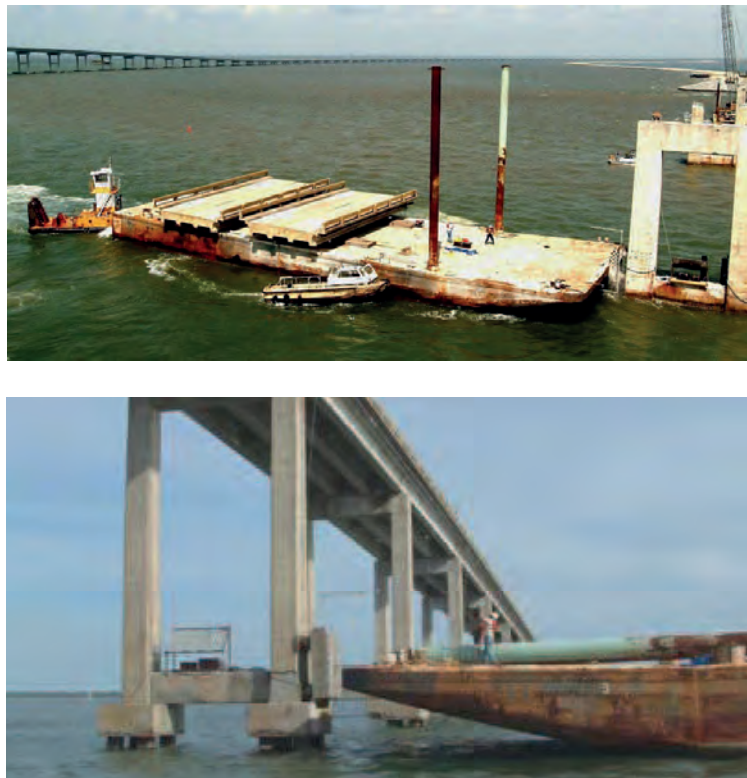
Barge impact tests on Pier-1 (top) and Pier-3 (bottom) of the old St. George Island Causeway Bridge [36].
